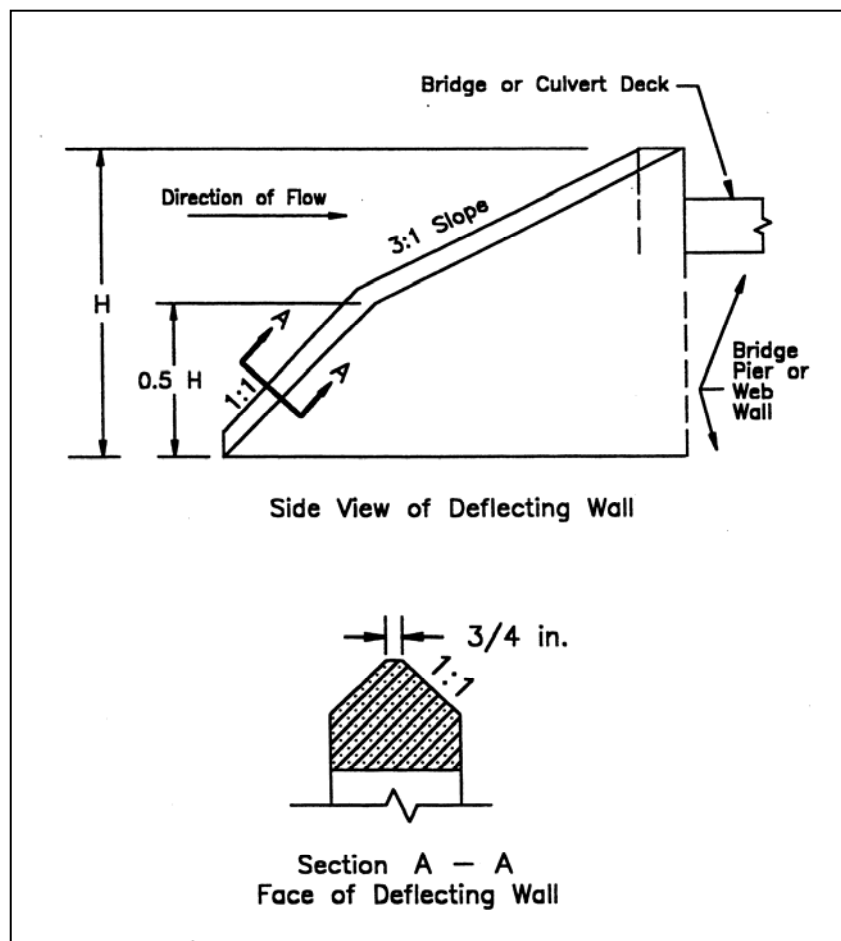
Debris Deflecting Wall on Upstream Face of Bridge Pier or Concrete Culvert Web Wall.
